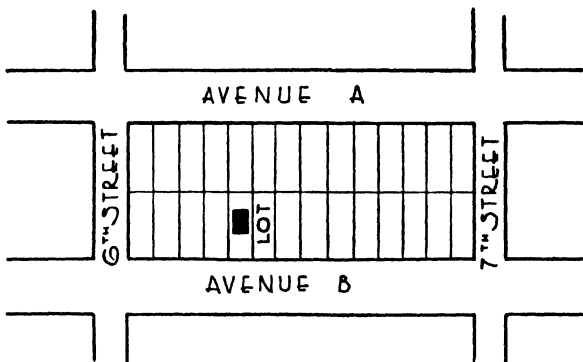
Rectangular block bounded by streets and avenues subdivided into lots.
